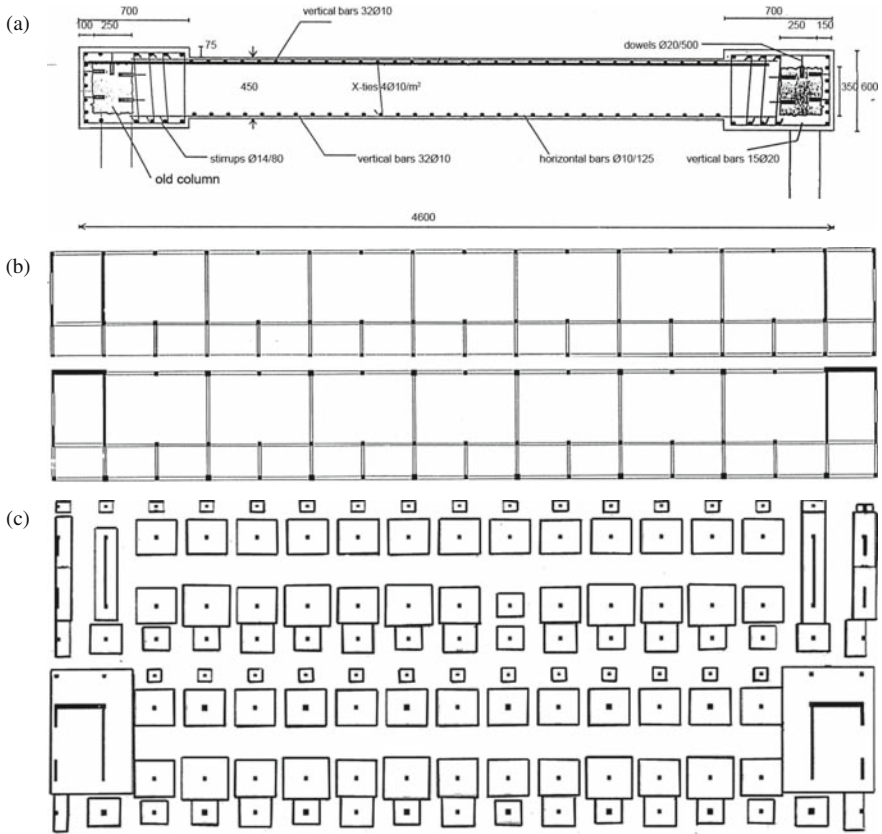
3-storey building strengthened in long direction with two new walls: (a) cross-section of added wall; (b) plan of framing, before (top) and after retrofitting (bottom); (c) foundation plan, before (top) and after retrofitting (bottom)
